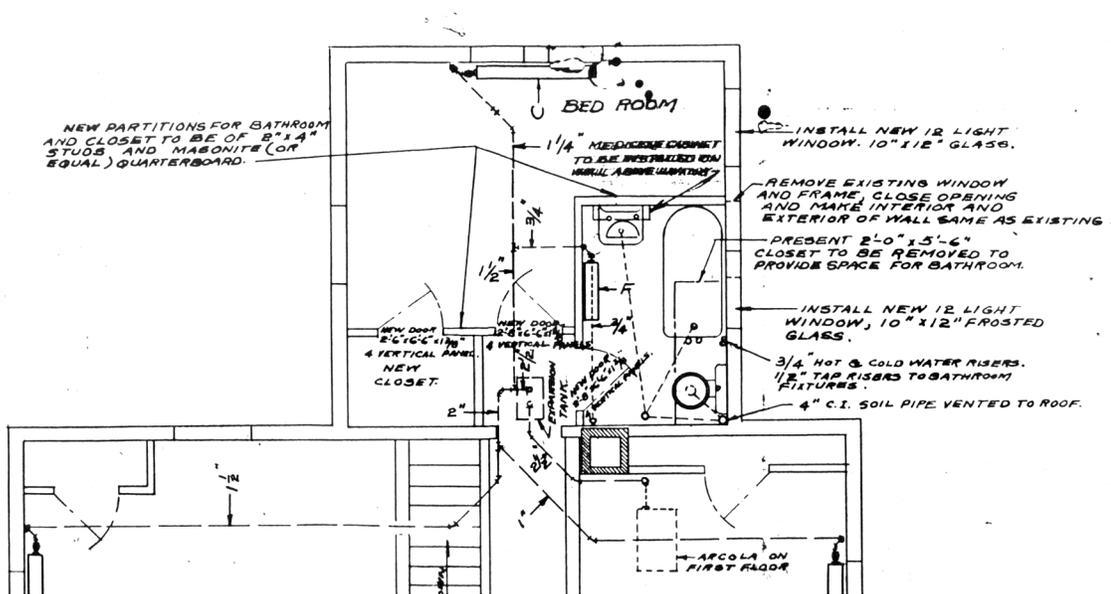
Detail of second floor changes for installation of plumbing and heating systems. (U.S. Coast Guard, 1934)
